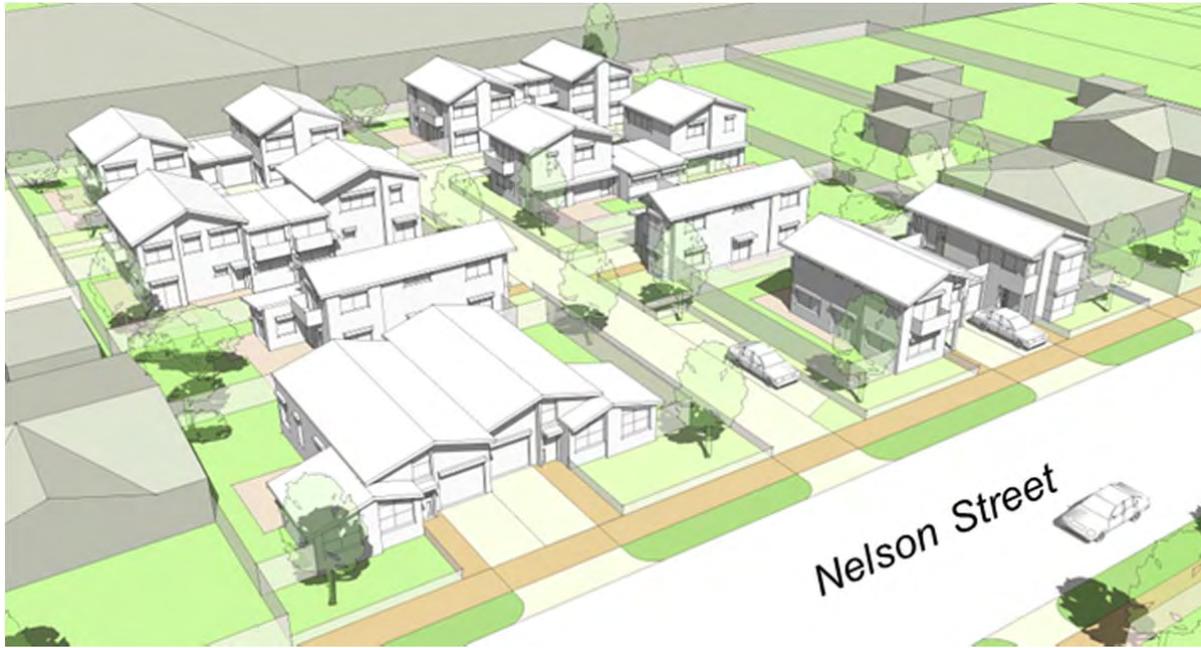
Demonstration Model 2 – Gabled Roof
